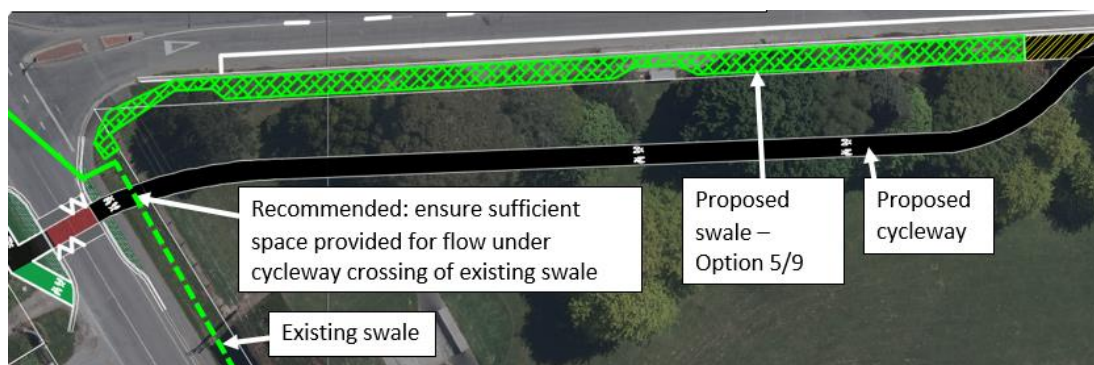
A proposed cycleway alignment – still to be approved by Roading and Community Greenspace
